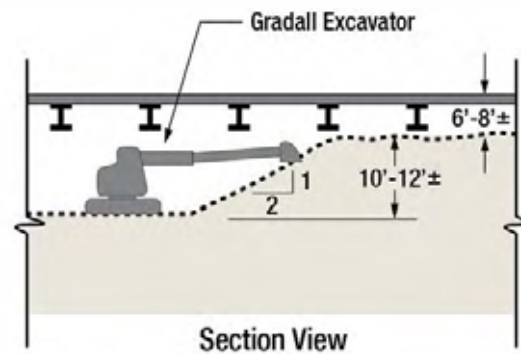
Plan Showing Excavation Procedure of Shallow Lifts with Low-Profile Gradall Excavator
